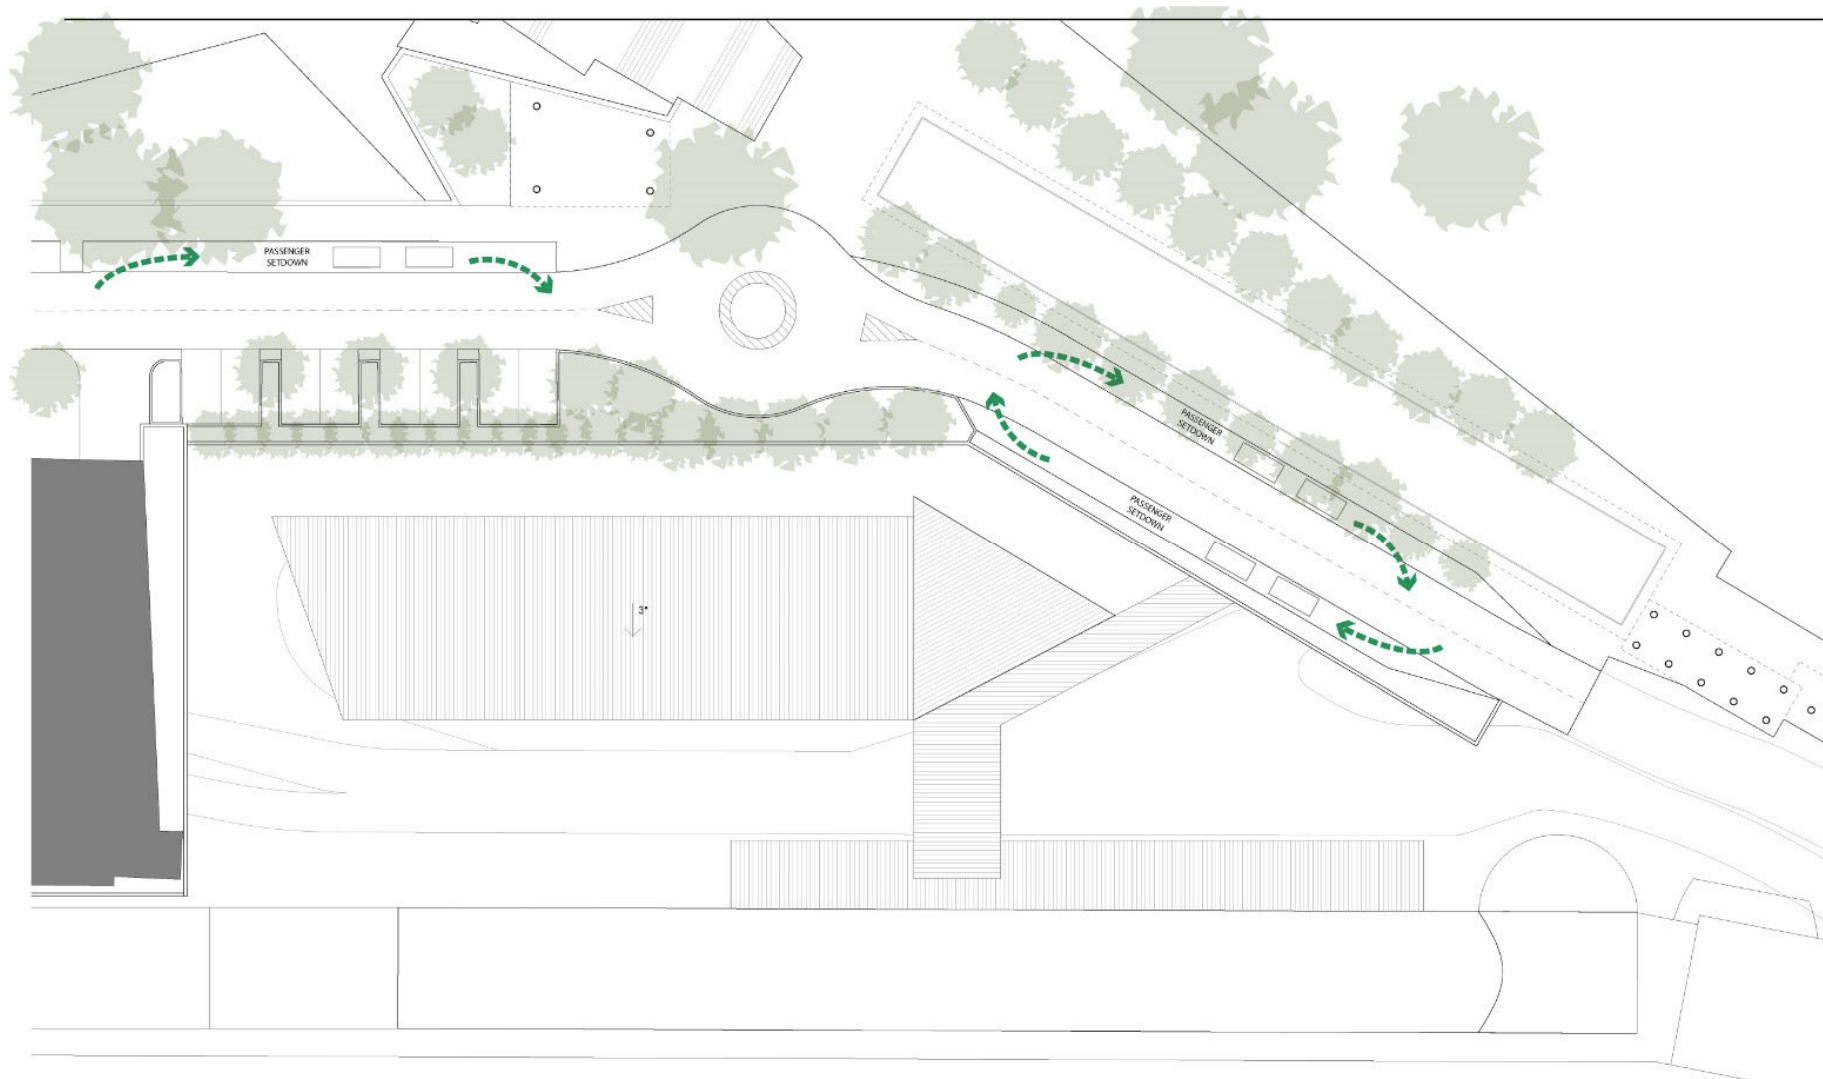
2018 proposed coach terminal layout at Parkland Boulevard
